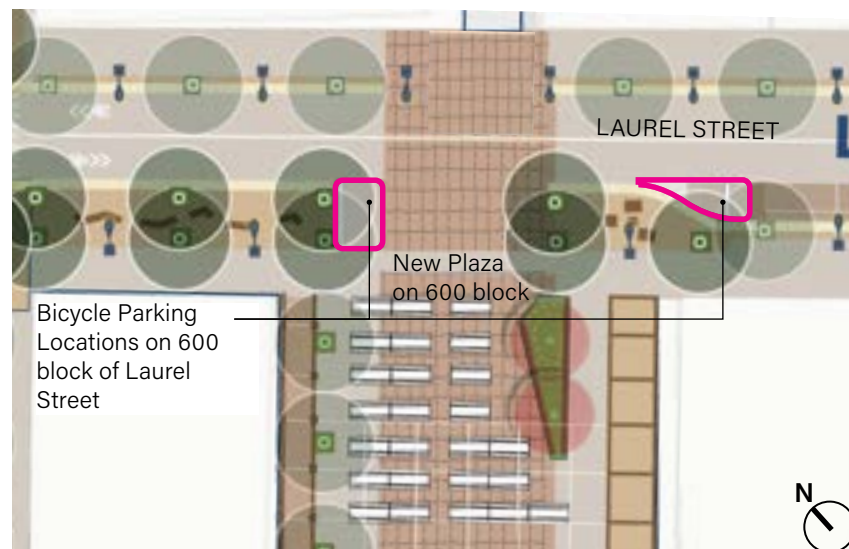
Public Bicycle Racks at the New Plaza at 600 Block of Laurel Street
